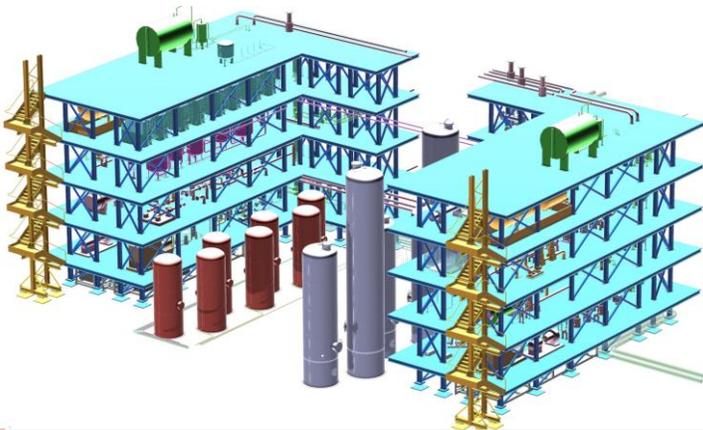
DETAILED IN-CONTAINMENT LAYOUT OPTIMIZATION
